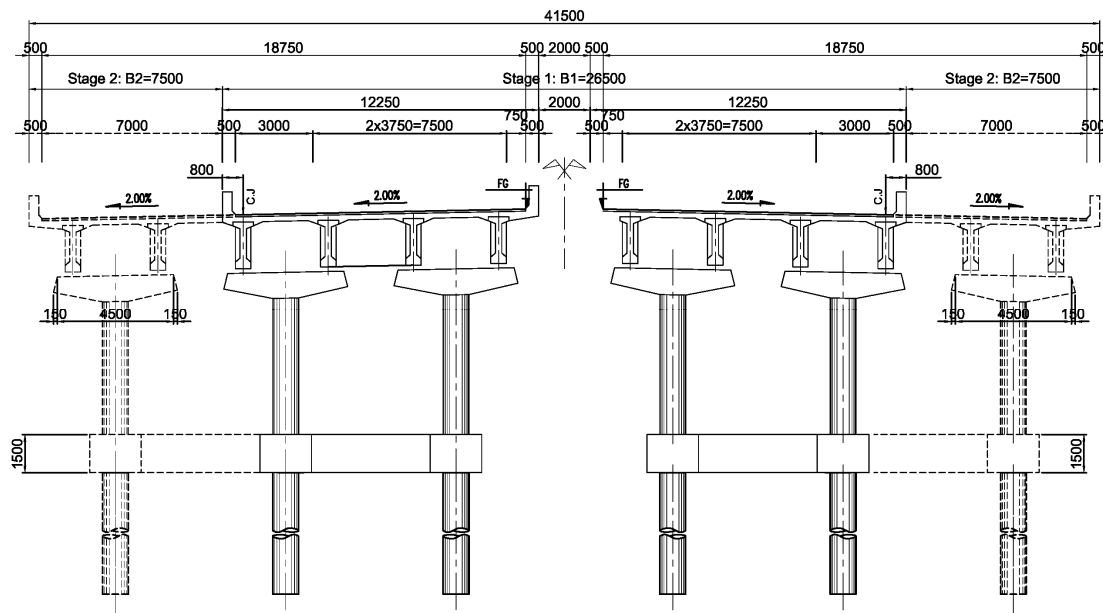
Viaduct, Short Span Bridge (PC I Girder L=33 m) Phase 2
